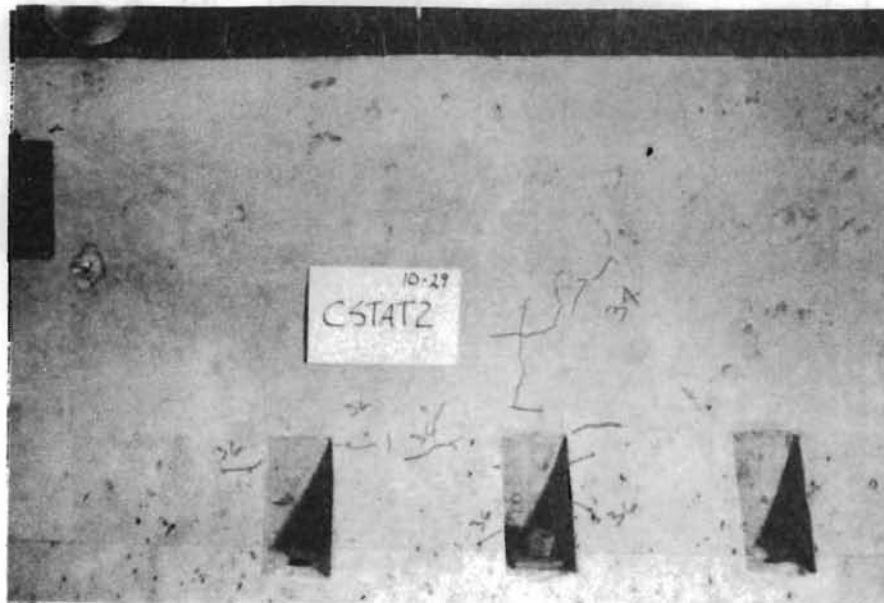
Inclined slab cracking and cracking of precast barrier: CSTAT2
